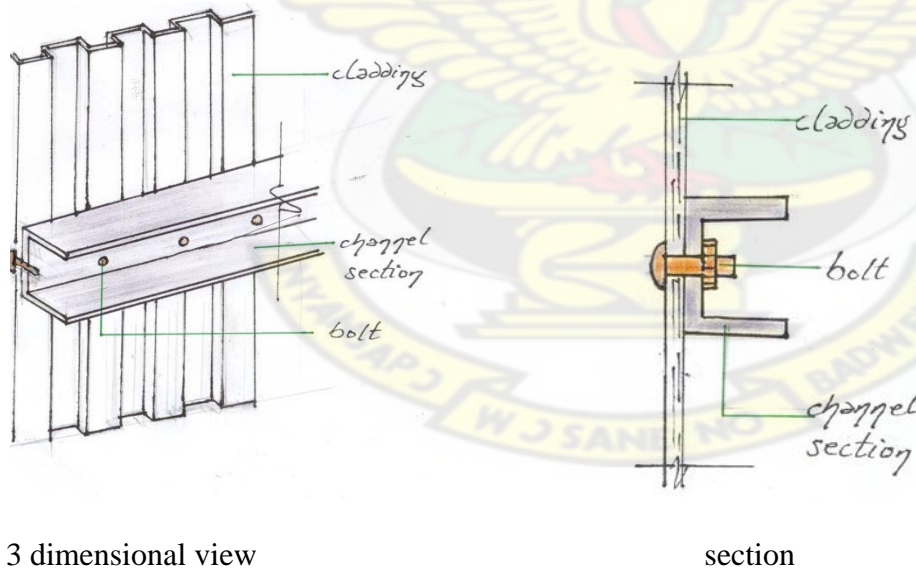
Detail of cladding fixing (Juabeng Oil Mills)
